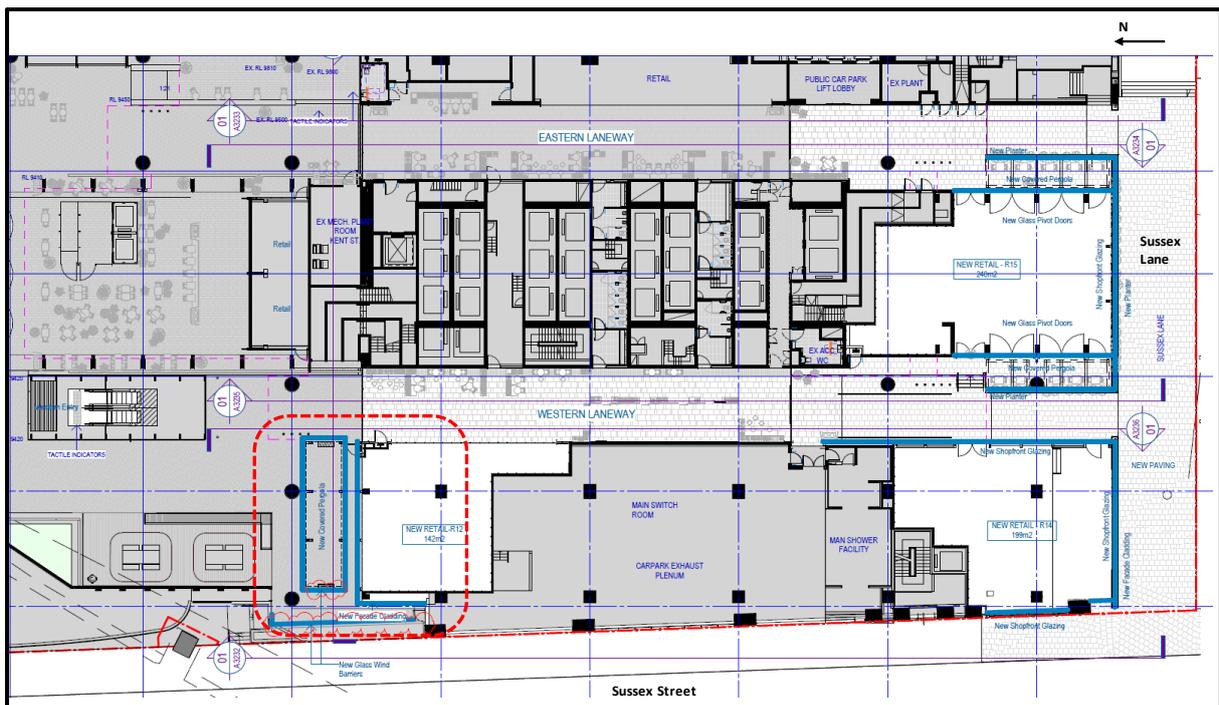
Location plan for proposed works (shown in red dashed line) on northern elevation (Urban Park level, floor level above Sussex Street).
